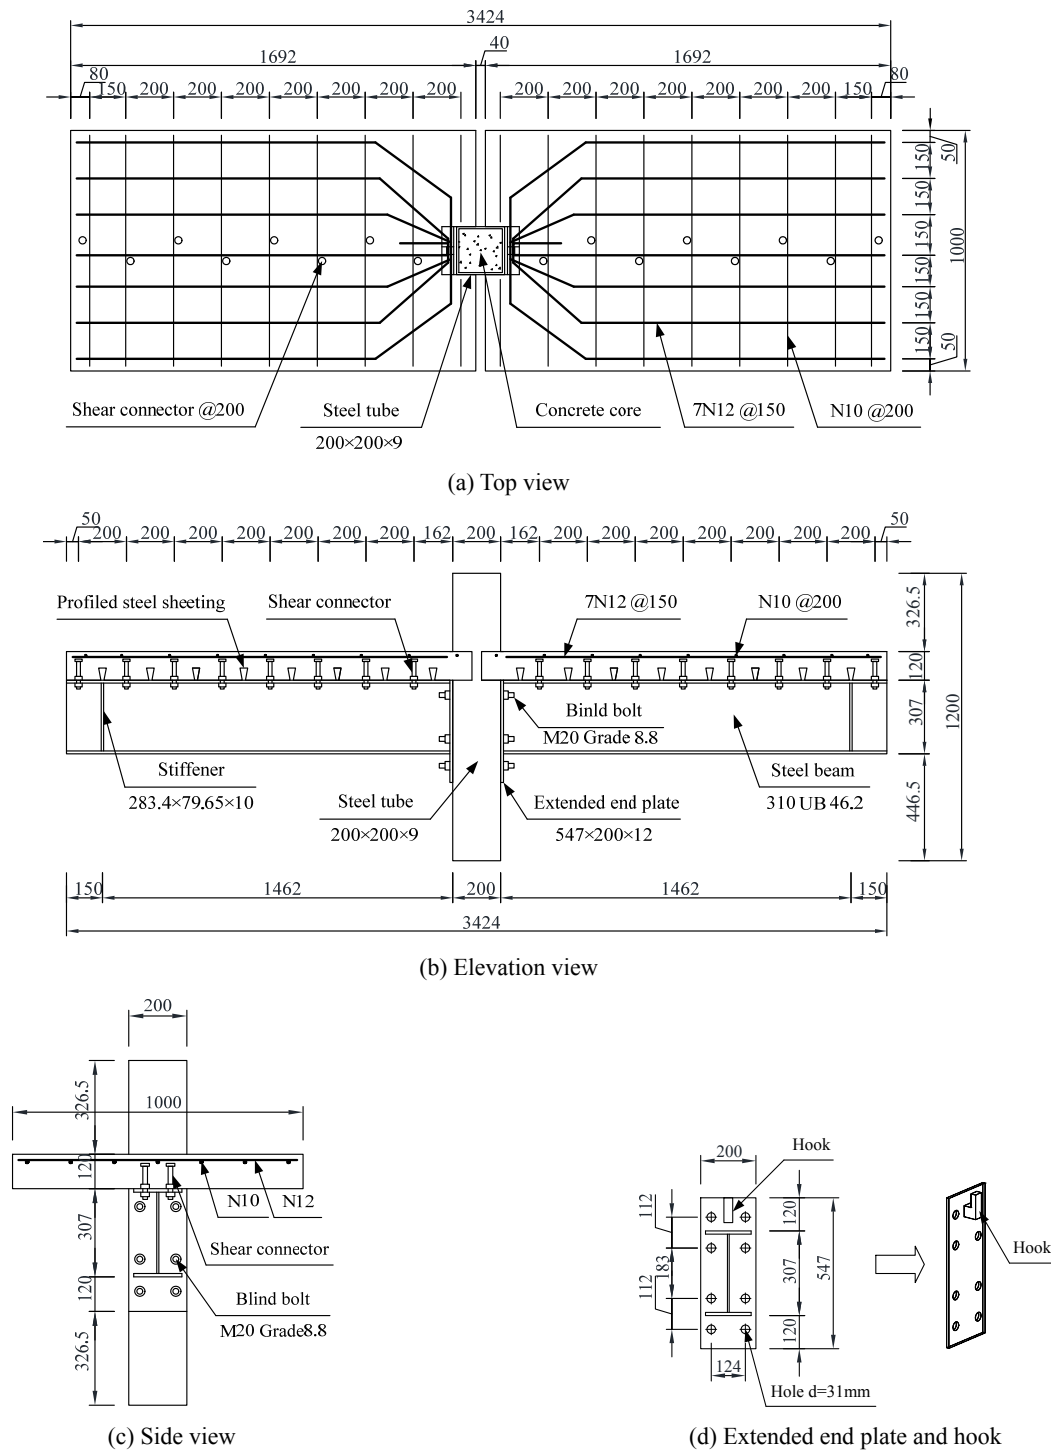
Geometry and details of demountable bolted composite joint (units: mm)
